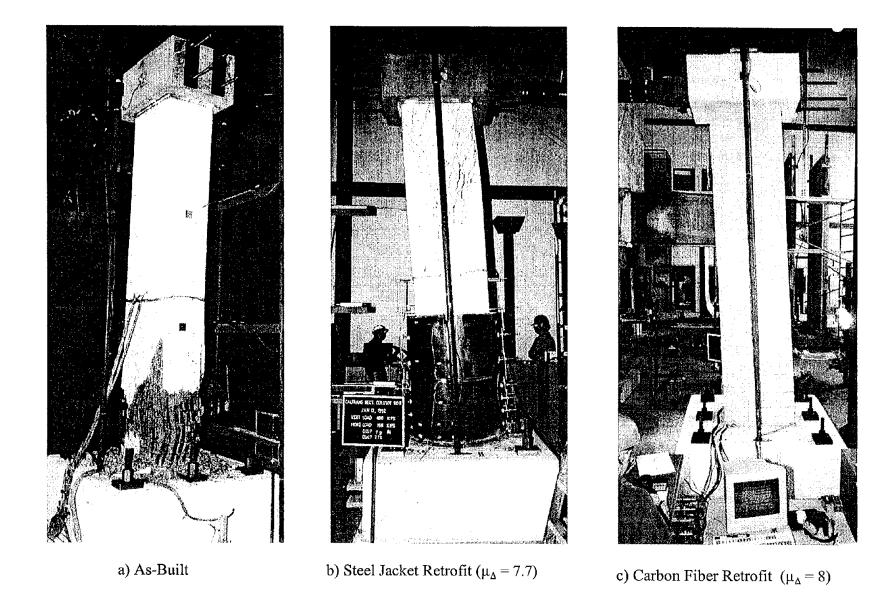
Flexural Hinge Failure and Retrofits of 5 % Reinforced Rectangular Column
